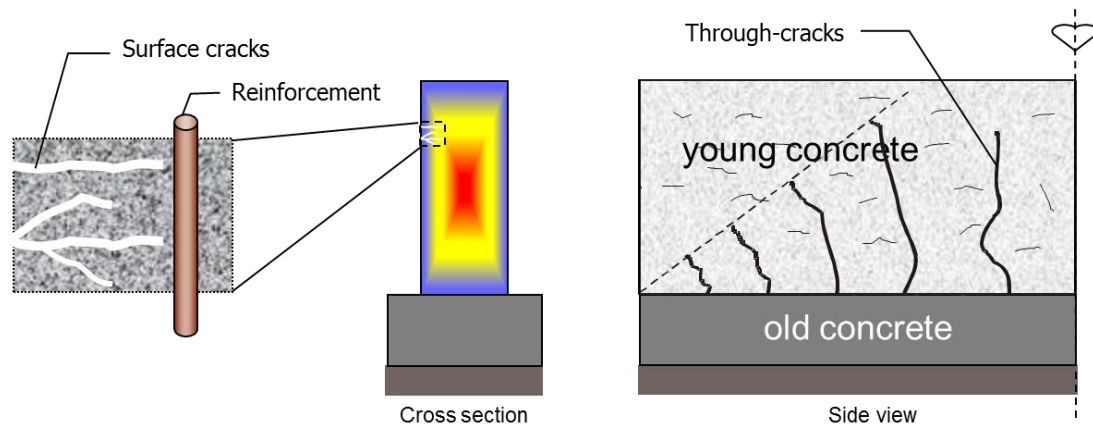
Concrete wall poured on rigid foundation slab. Probability of formation of surface cracks and through-cracks (after Sule²⁹).
